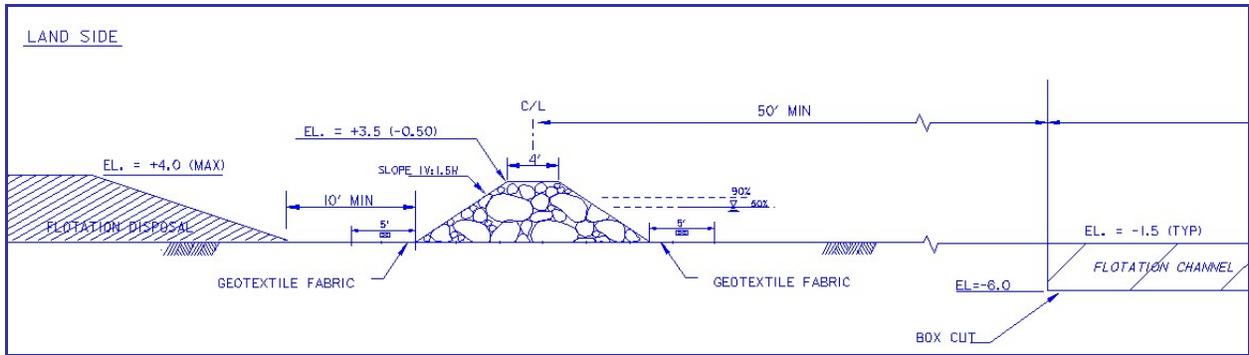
Typical Dike Layout with Flotation Disposal (from ME-22)
